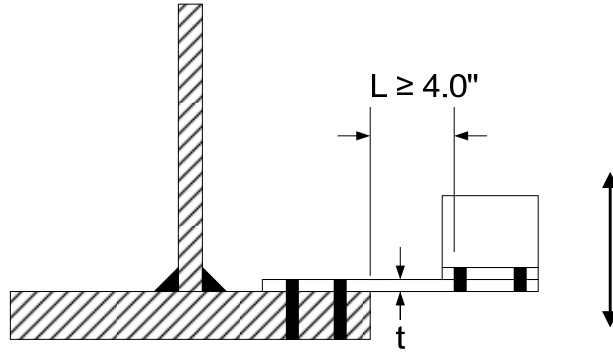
Schematic of Vibration at Lateral Gusset Bolted to the Flange
